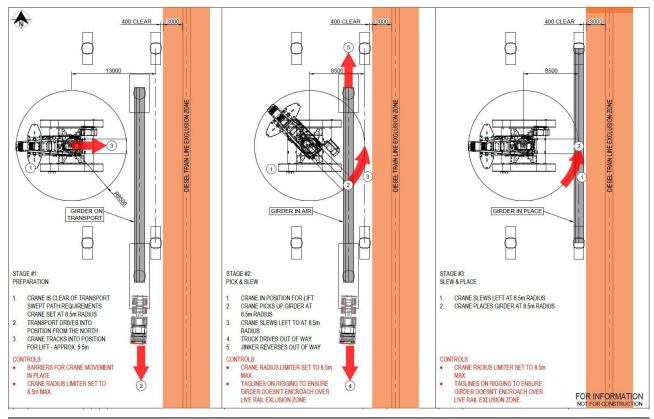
Proposed staging for delivery and lifting of precast viaduct beams
